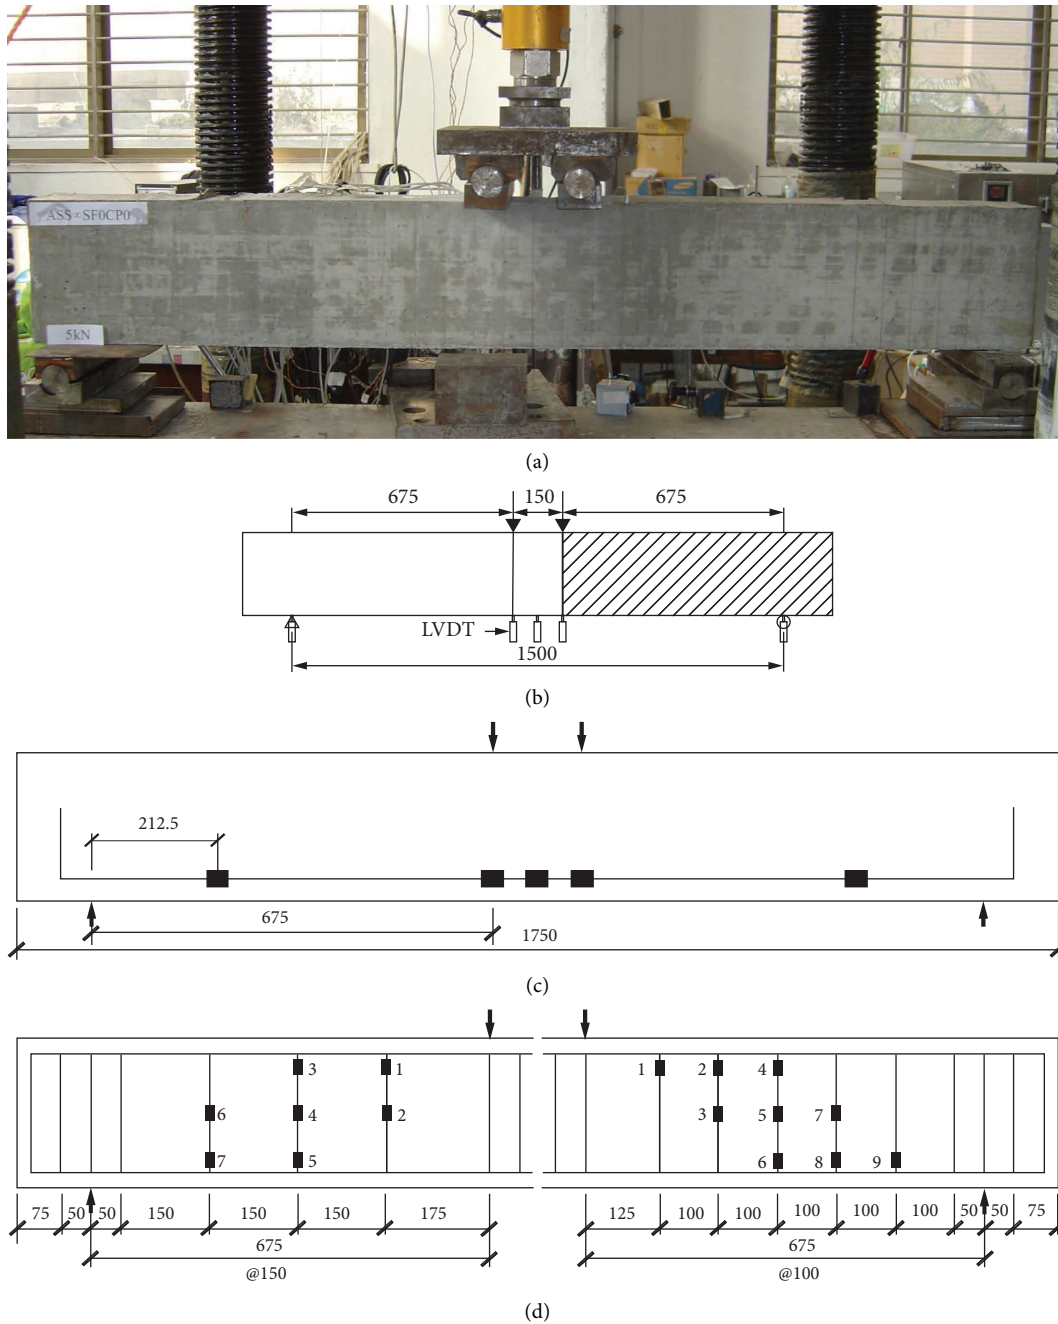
Loading and measuring system. (a) Loading mode. (b) LVDT arrangement. (c) Bottom load-bearing reinforcement strain gauge. (d) Stirrup strain gauge.
